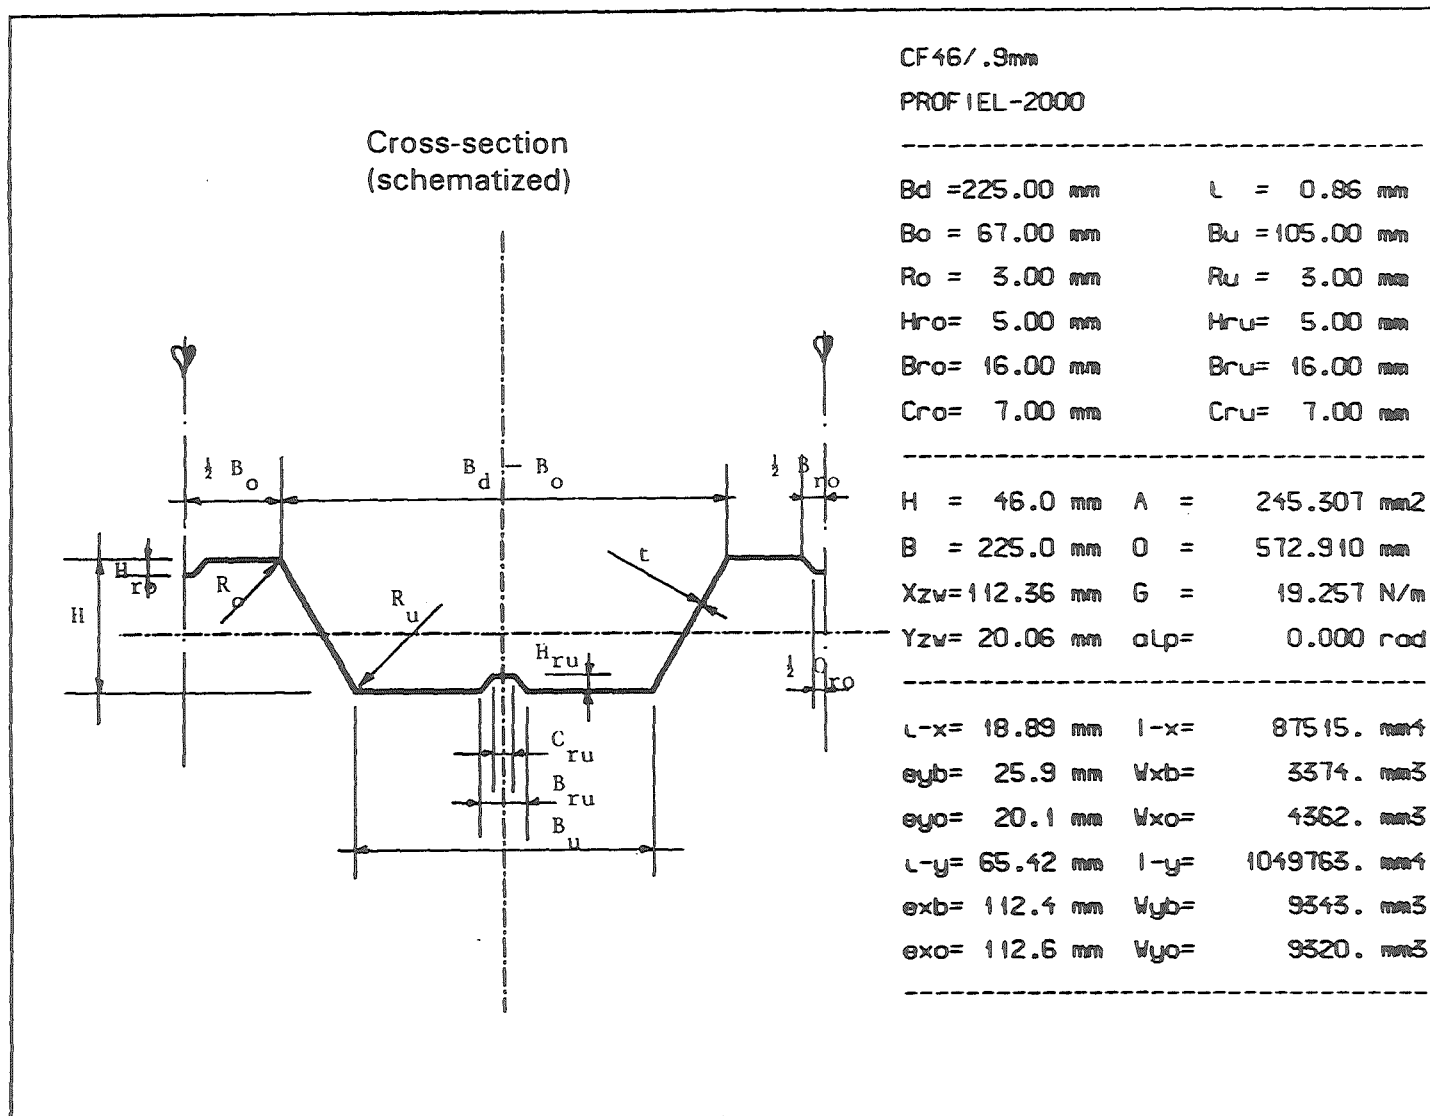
Sheeting profile for deep steel deck PMF 46/0.9
